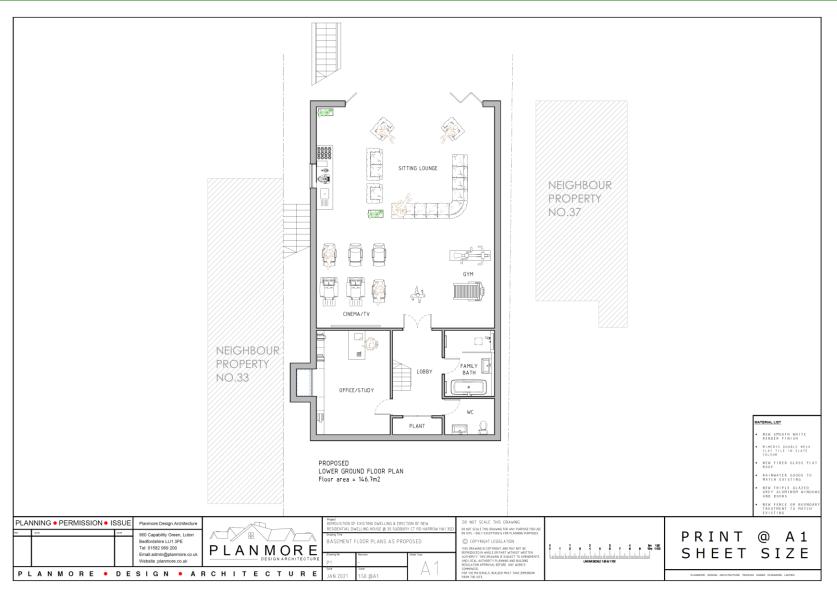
Proposed Basement Plan (Reproduced by courtesy of Planmore)
